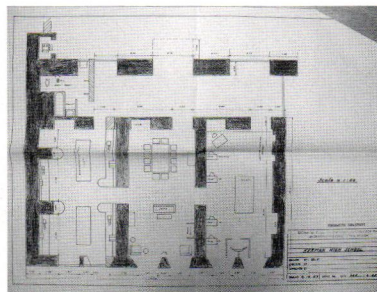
Plan of a school/ model house in Kirman/ Kerman's Division.
